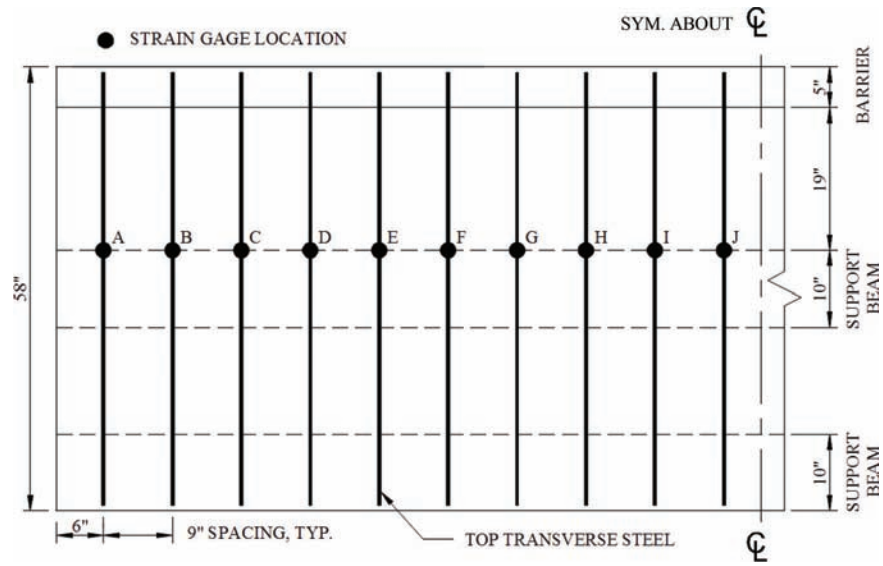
Specimen 2 strain gage instrumentation (plan view).
